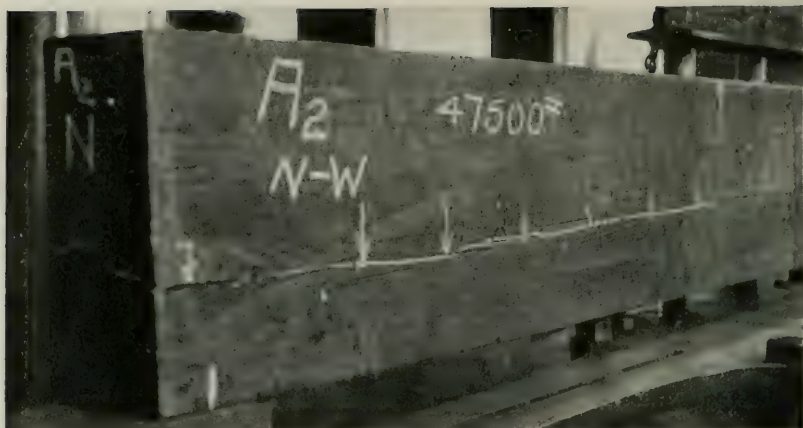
VIEWS OF BEAMS AFTER FAILURE.
